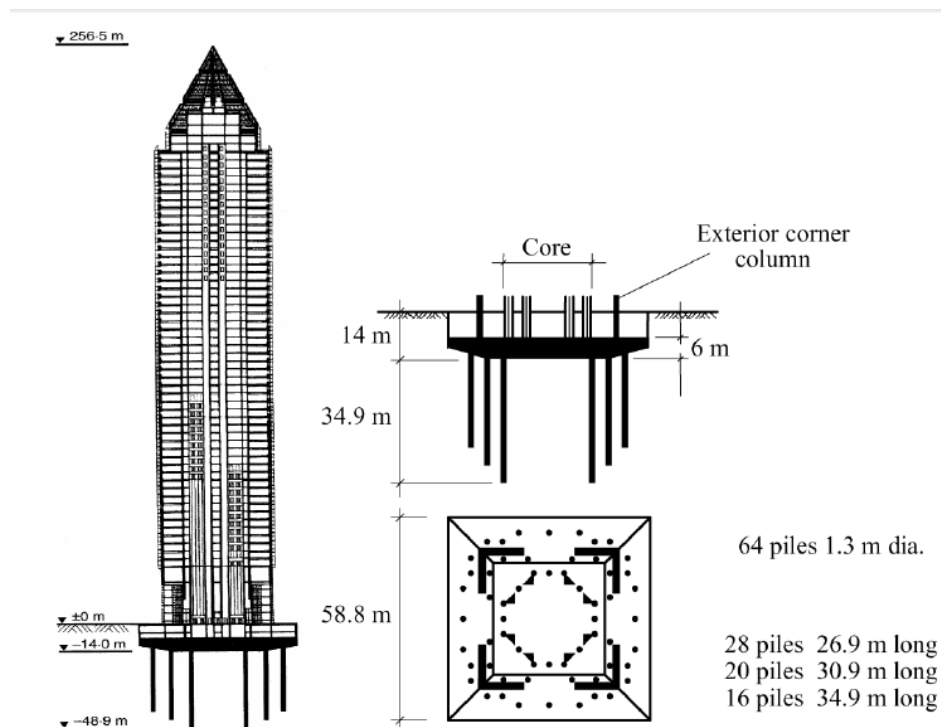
Layout of Messeturm with piled raft after Chow/ Small (2005)
